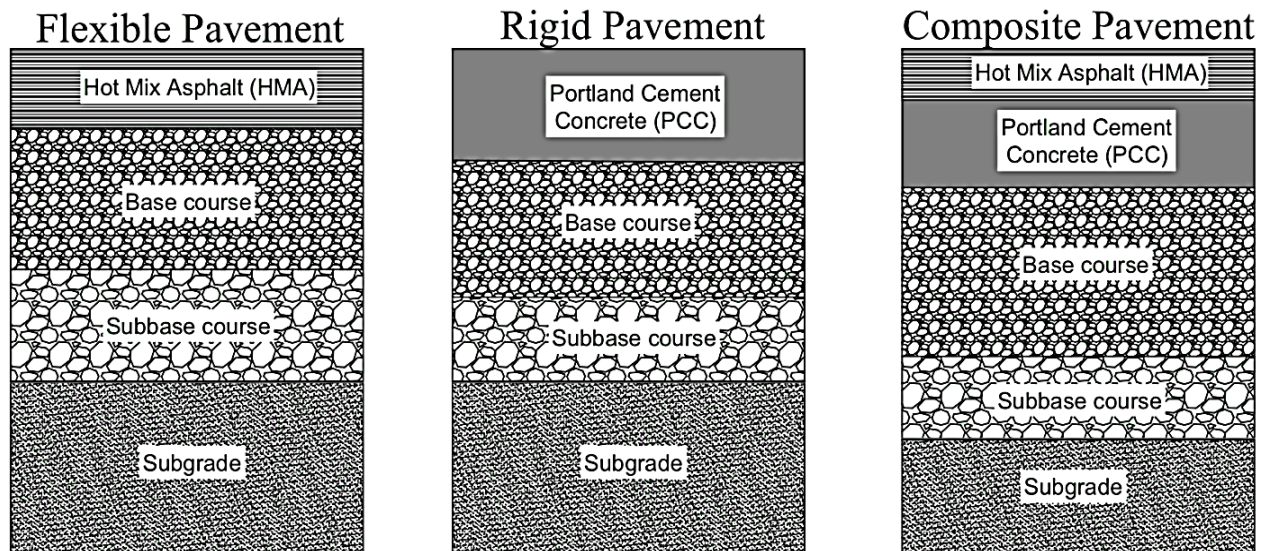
Typical pavement structure for flexible, rigid and composite pavements
